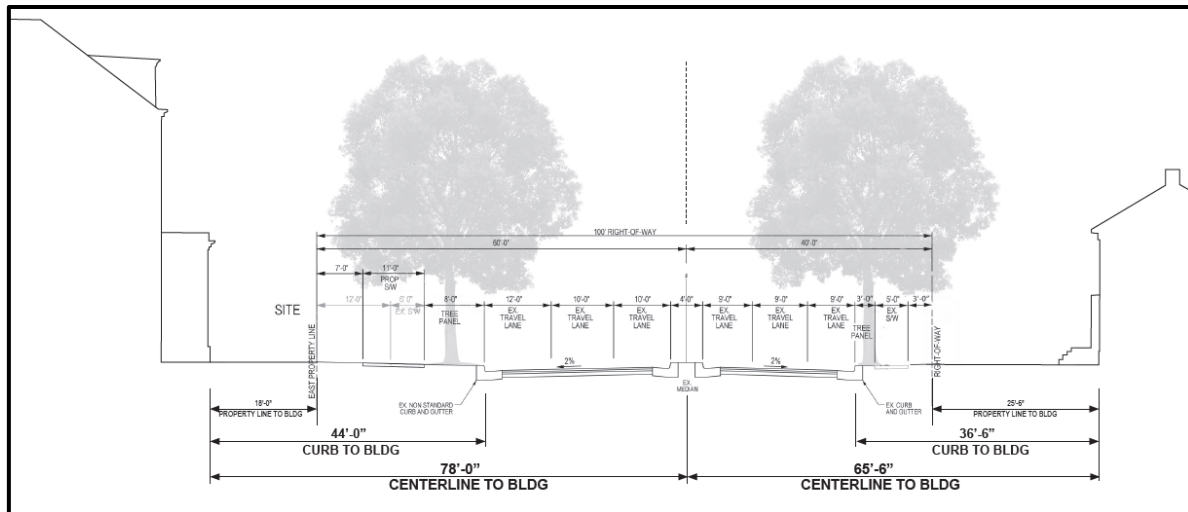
Cross Section of Connecticut Avenue looking north, with Subject Site on the left
